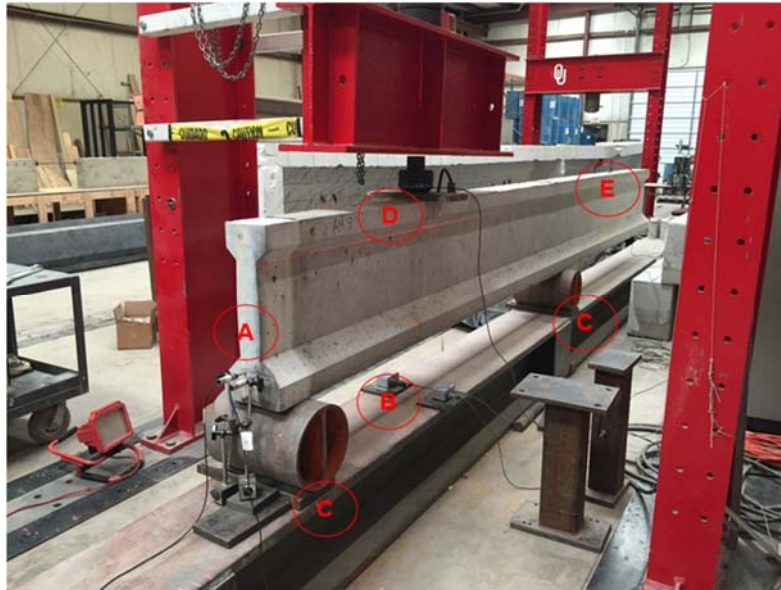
Typical shear test setup looking towards the north – (A) LVDT 1 & 2, (B) wirepots 1 (west) & 2 (east), (C) supports at 9 ft center-to-center, (D) single load point with load cell at 41 in. from end of beam, and (E) 8 ft - 8 in. overhang of the beam
